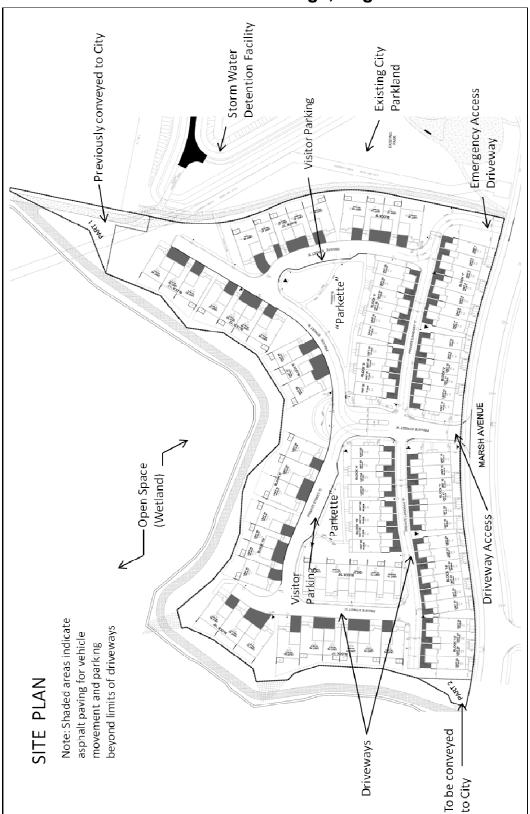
Exhibit C – Site Plan Set of Drawings, Page 1 of 15
